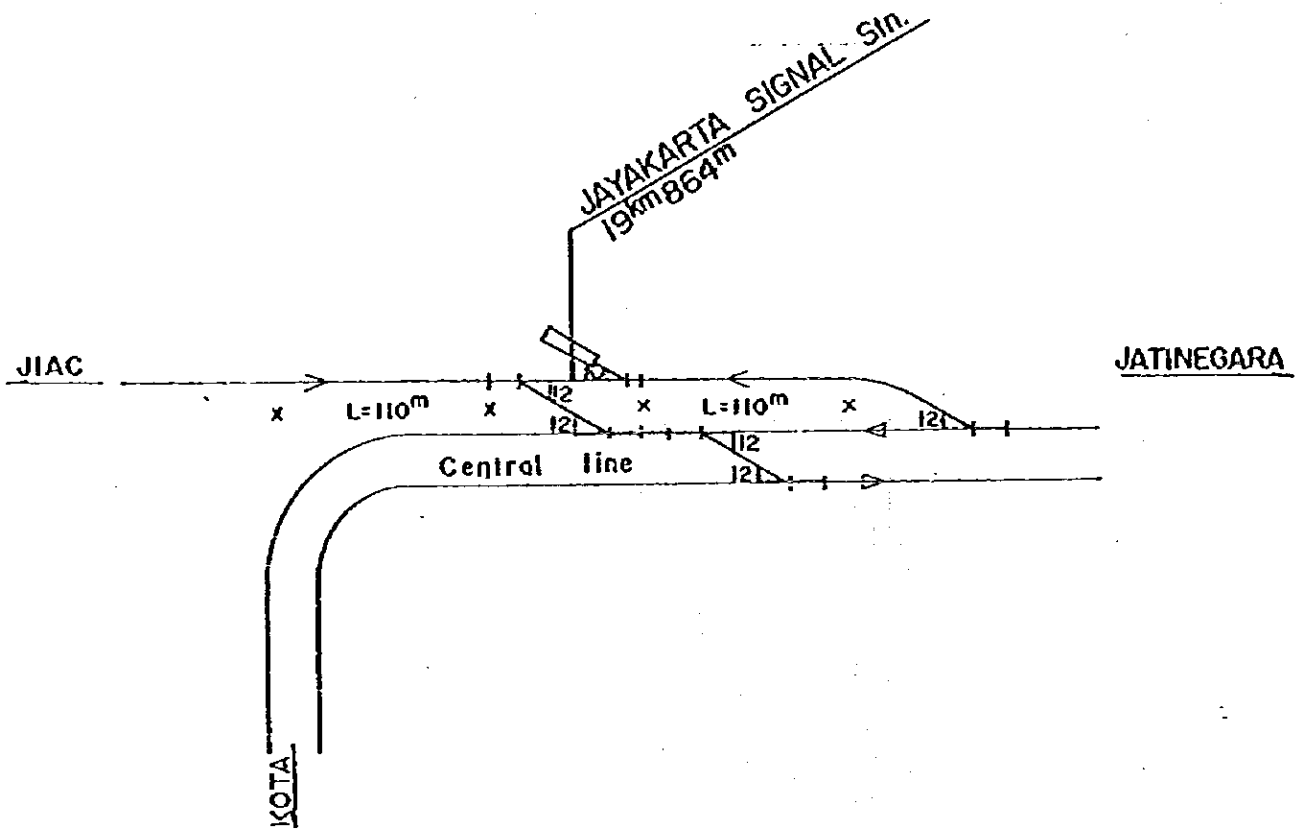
Jayakarta Signal Station Schematic Layout (At Grade)
